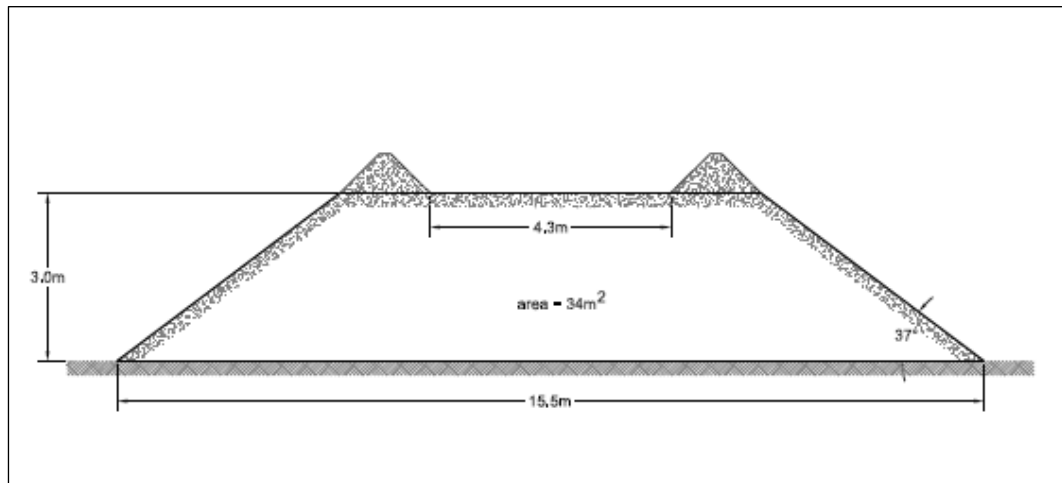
Typical Cross-section showing Full Fill Portion (Fill Slope 37°)
